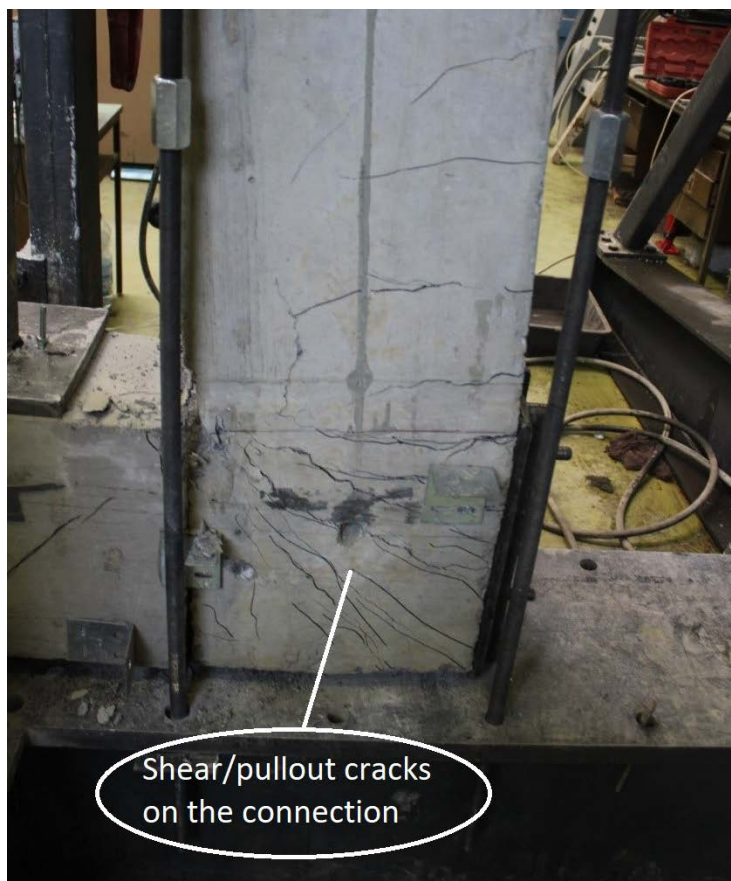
Crack distribution on specimen "S 9, H.D." after failure
